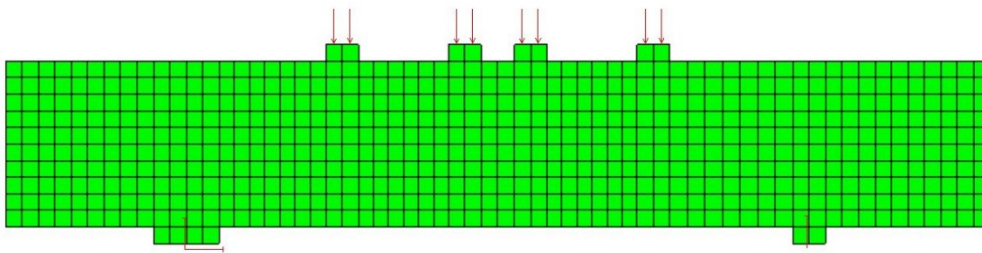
Geometry, mesh, boundary conditions and loading of beam S1-1 (Fang, 2013)
